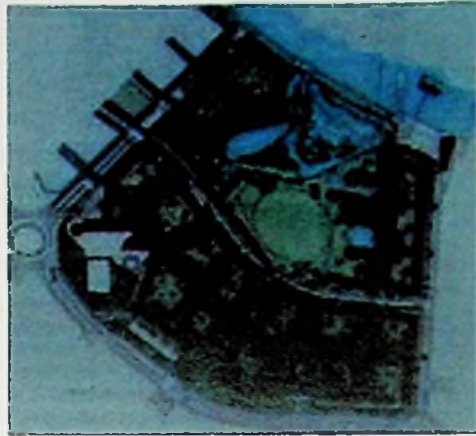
Master Plan for Housing, Greenwich Millennium Village
